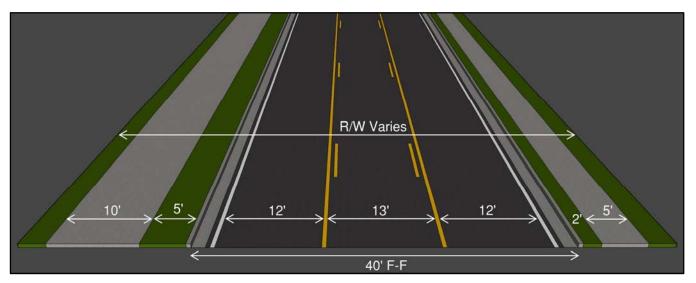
Hamilton Road (East) Initial Proposed Typical Section
